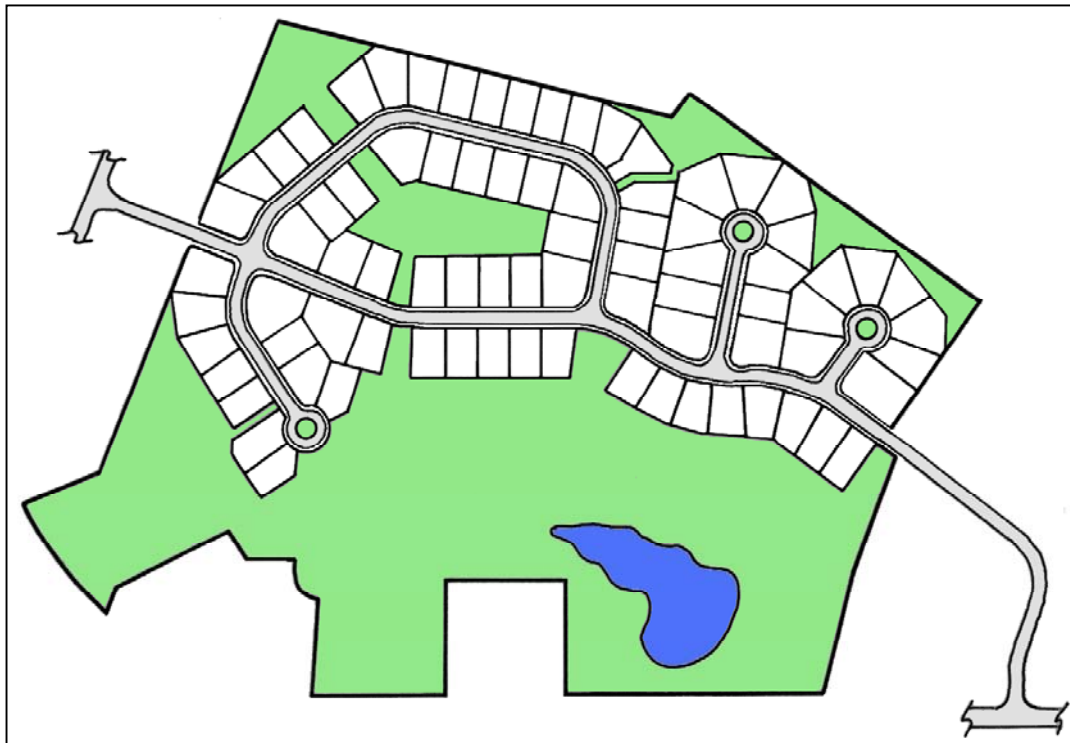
Open Space Subdivision Site Design Example
